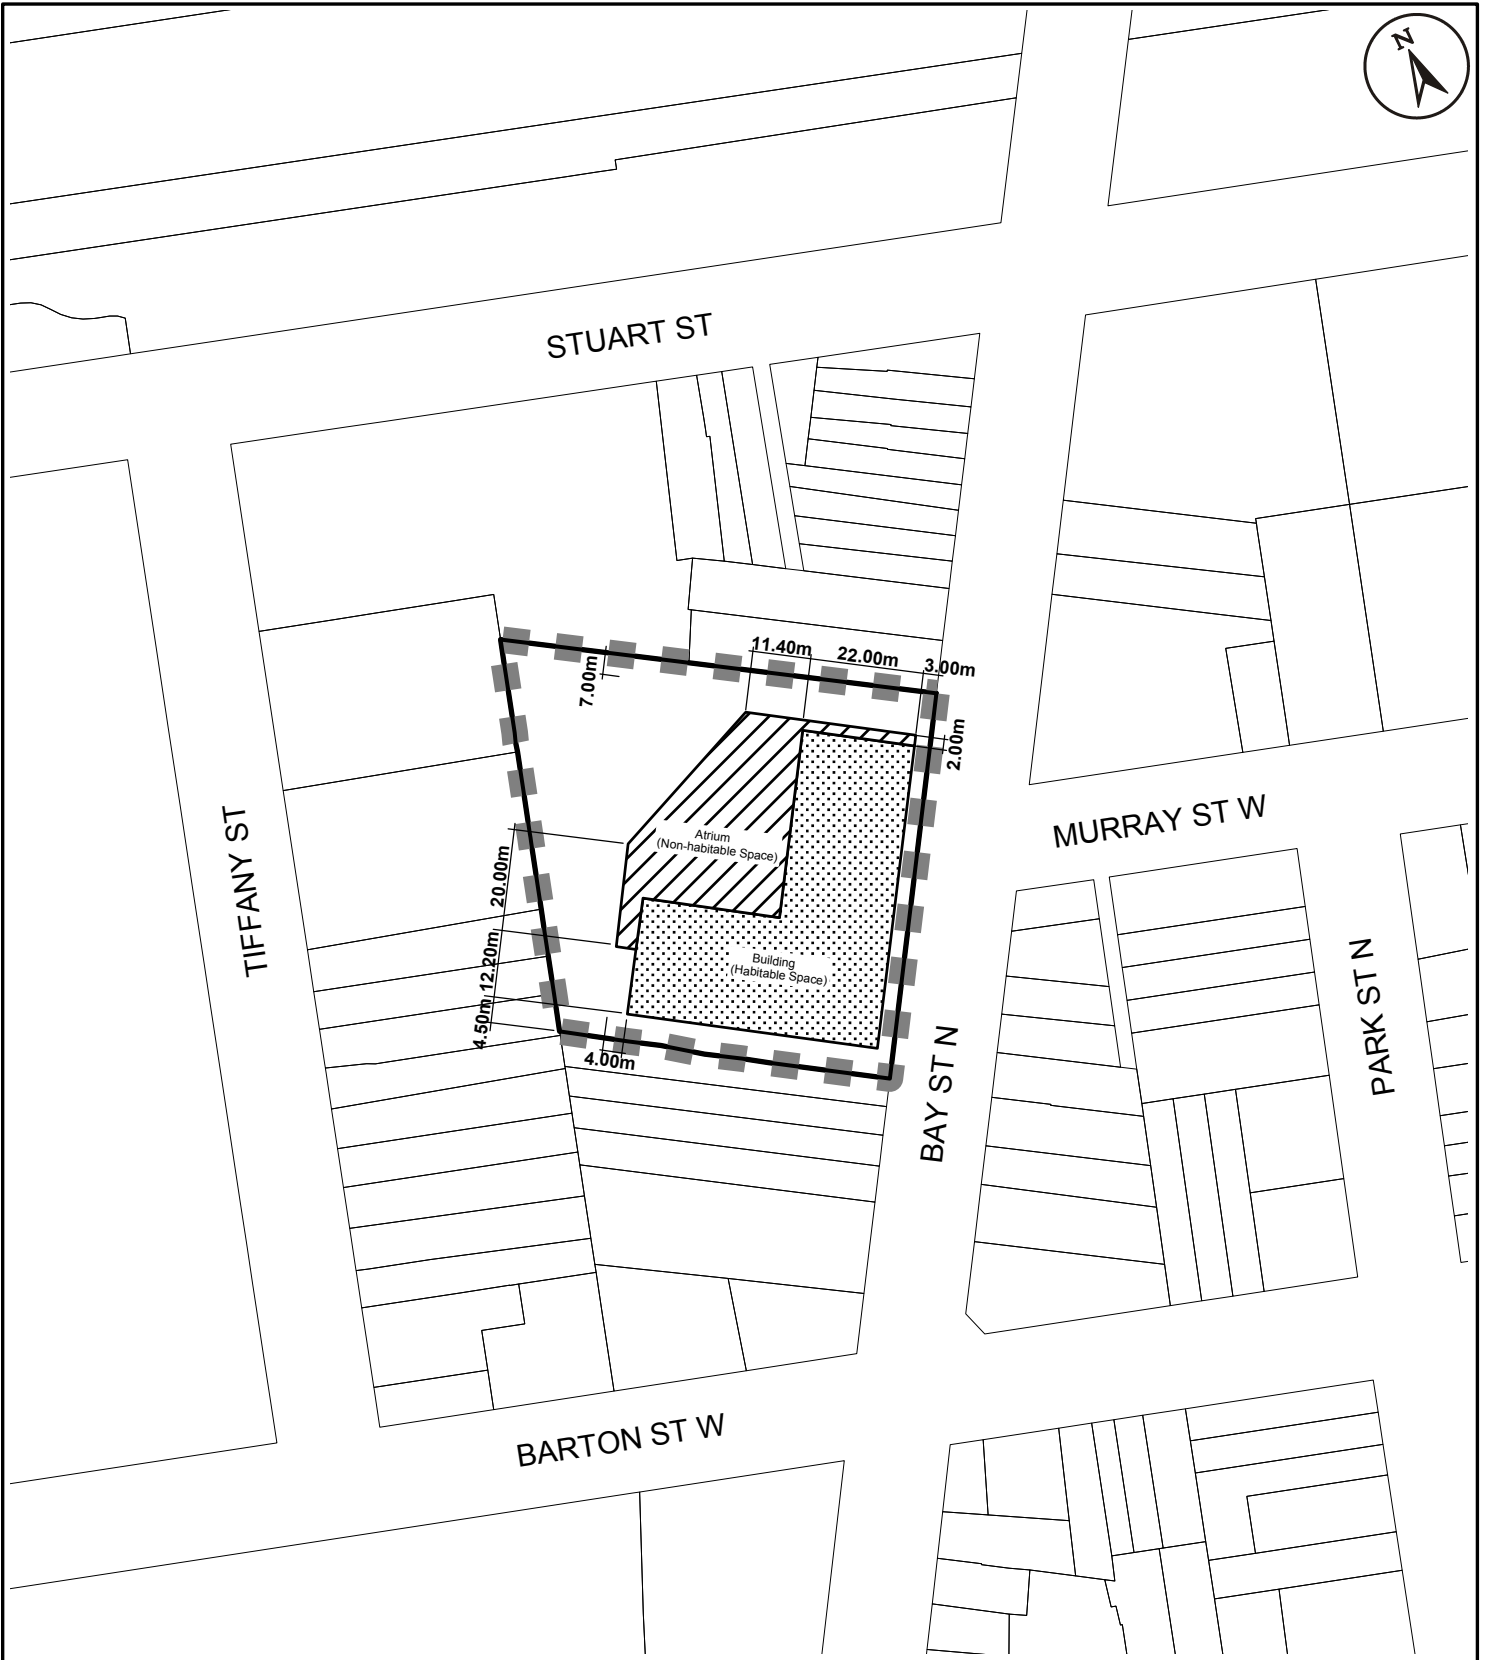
257, 259, 263, 269, 271, 275 and 279 Bay Street North, Hamilton
